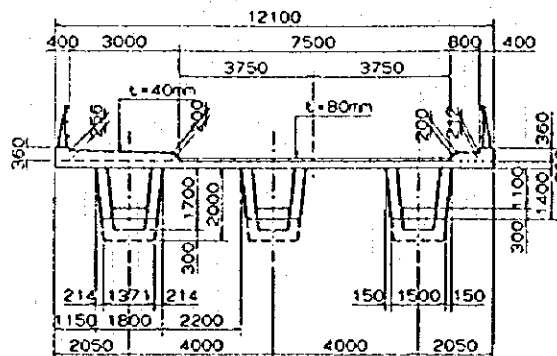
Cross-Section of Sheikh Hussein Bridge
